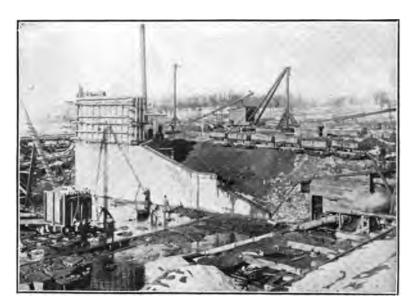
Foundation for Dam Abutments at Palatine Bridge.
